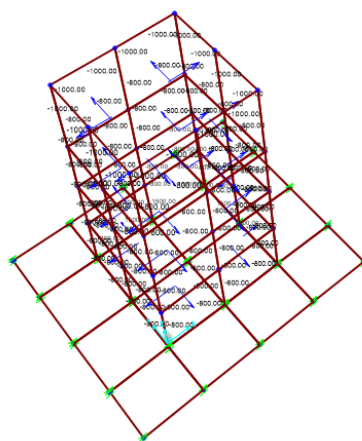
Applied hydrostatic pressure on walls(Oily Sump Pit)
